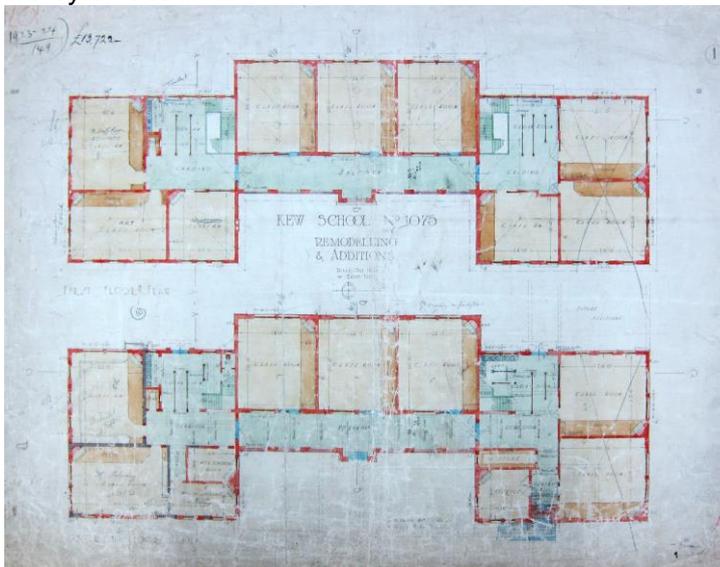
The original floorplan of the 1923 building (Source: PROV).
